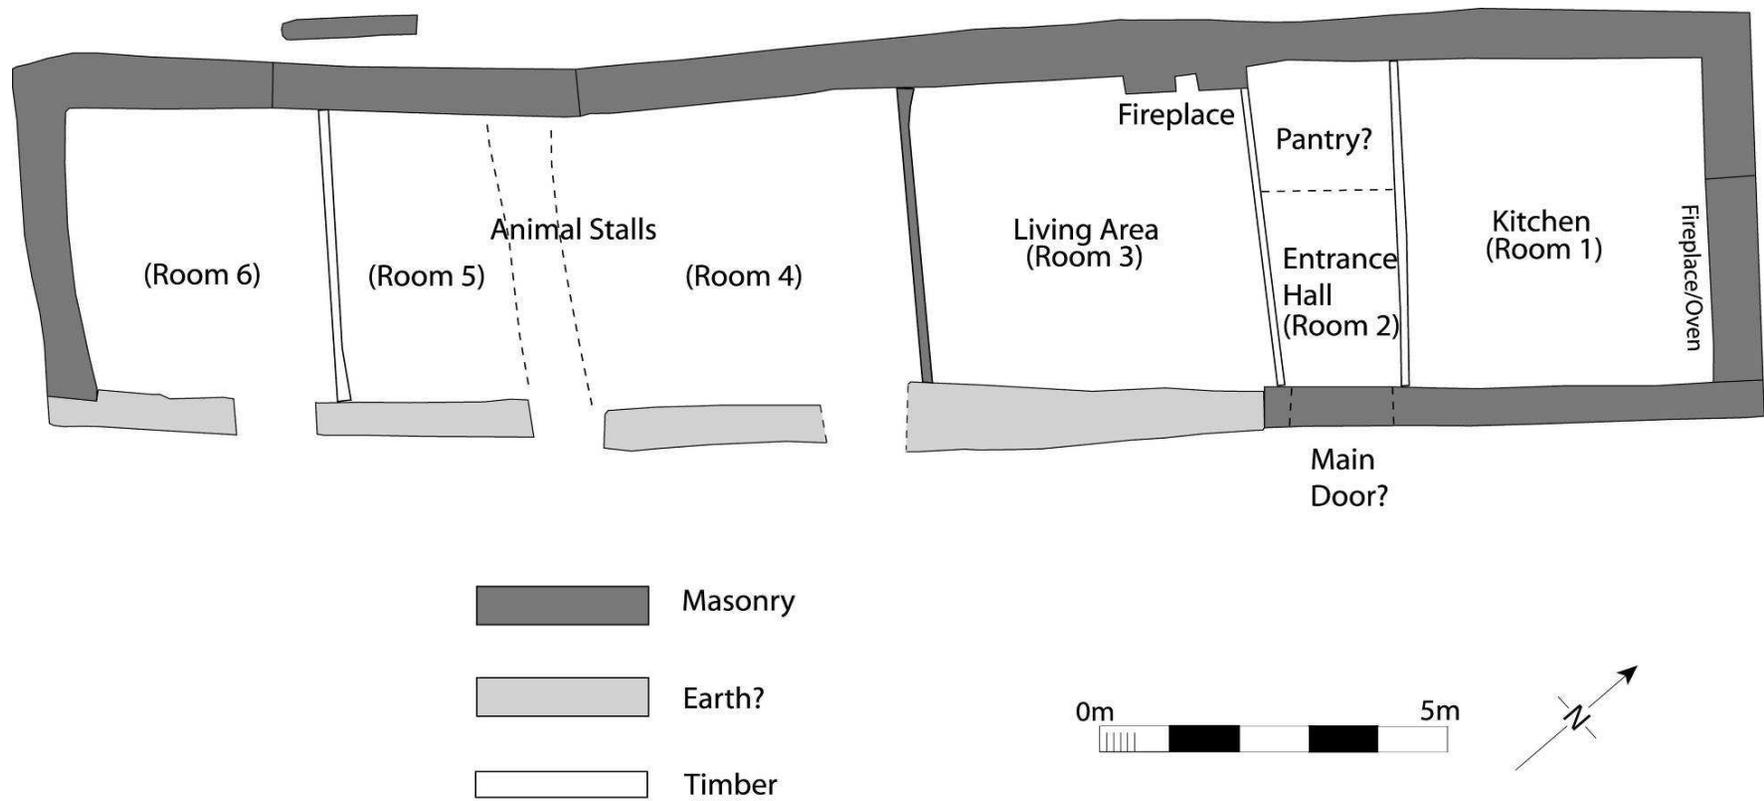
Simplified plan of the main farm building, showing the walls and room divisions mentioned in the text.
